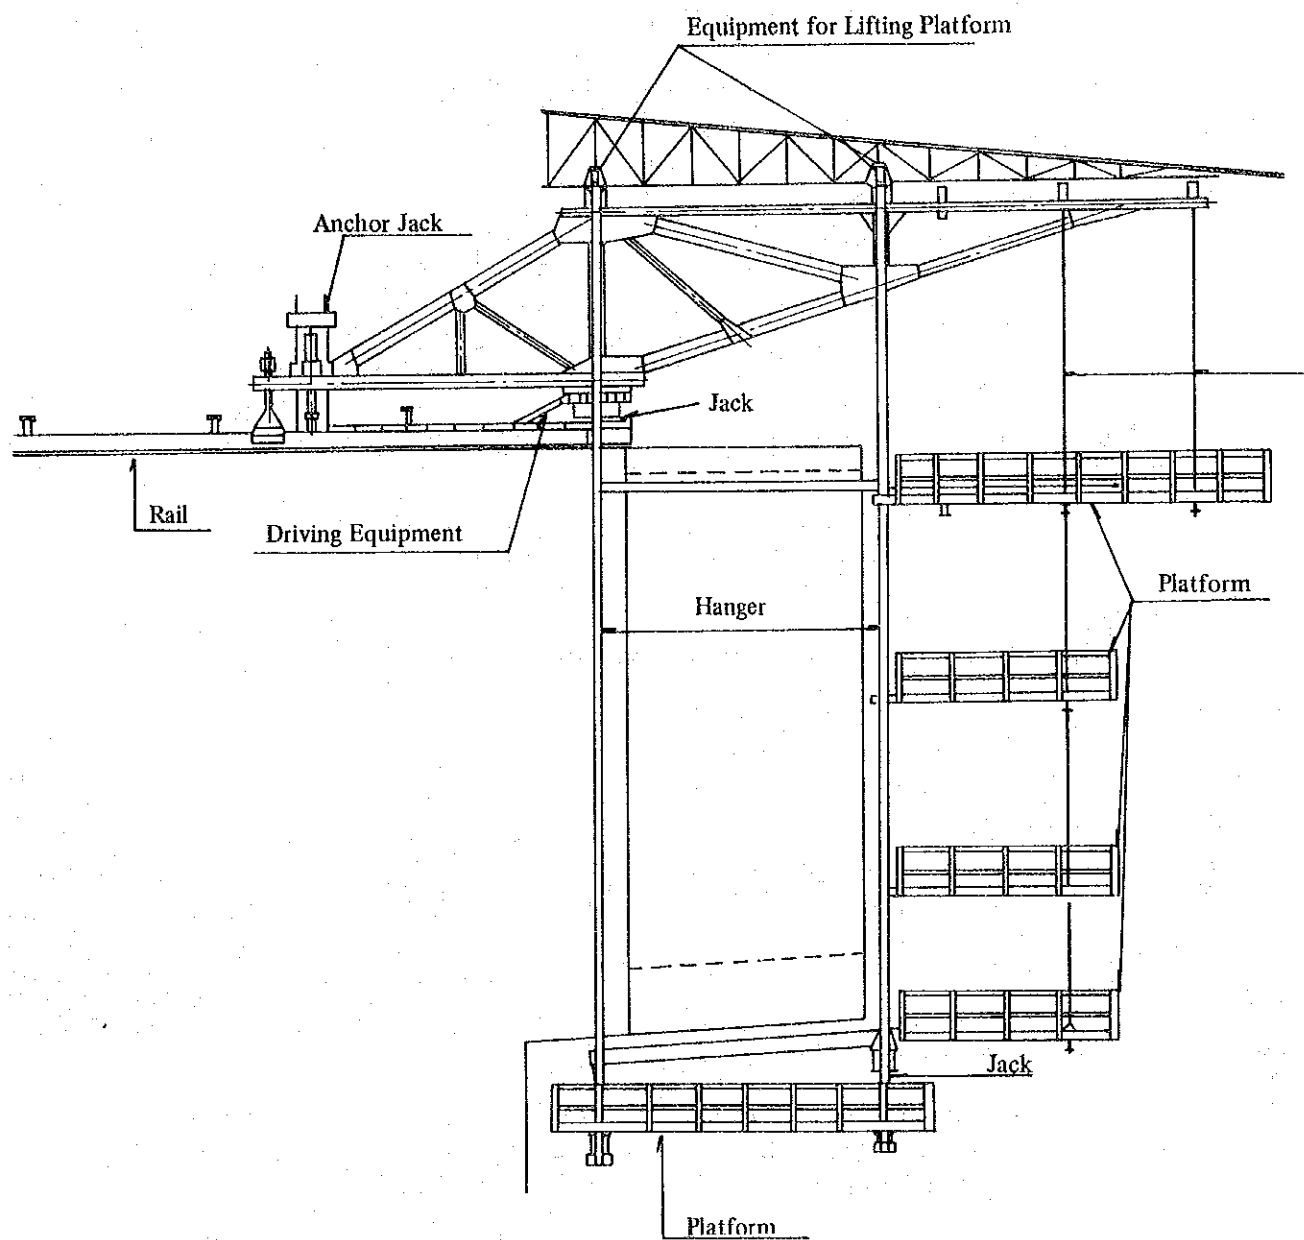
CONCEPTIONAL PLAN OF CANTILEVER CARRIAGE
